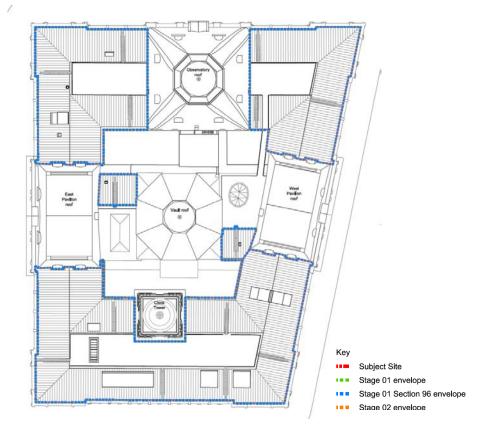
Lands Building Plan Concept Envelope Assessment *Source: MAKE
